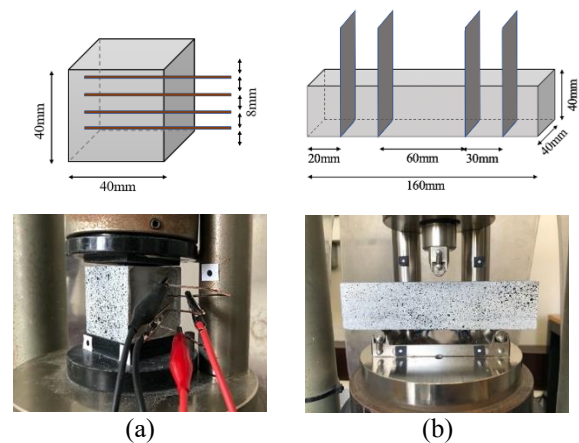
Four-probe electrodes arrangement of (a) cube and (b) prism specimens.
